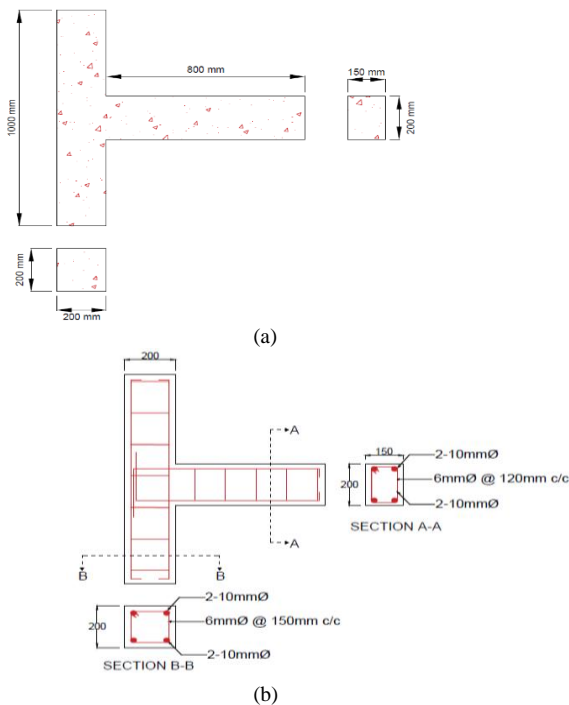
(a) Dimensions of the beam-column joint specimen, (b) Reinforcement detailing of beam-column joint [6]
